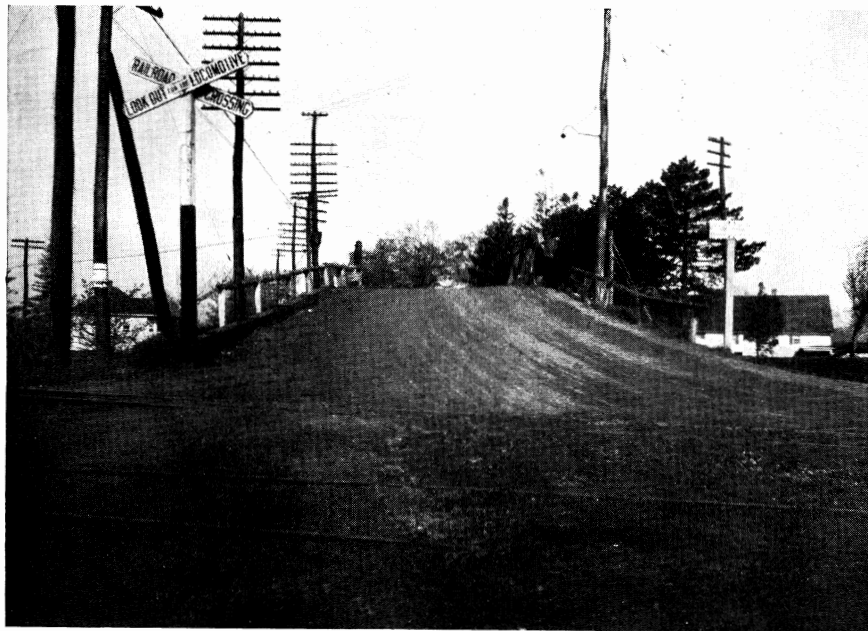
Railroad and canal bridge on State Highway at Kenil.
